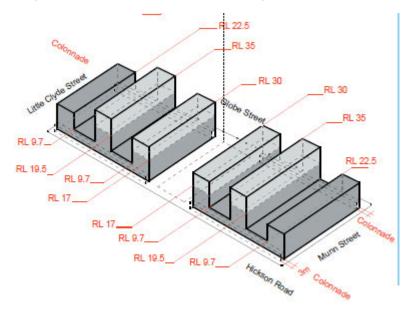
Block 7 built form as envisaged by the approved Concept Plan Design Principles and Controls (Source: EDH Part B Concept Plan October 2006)
